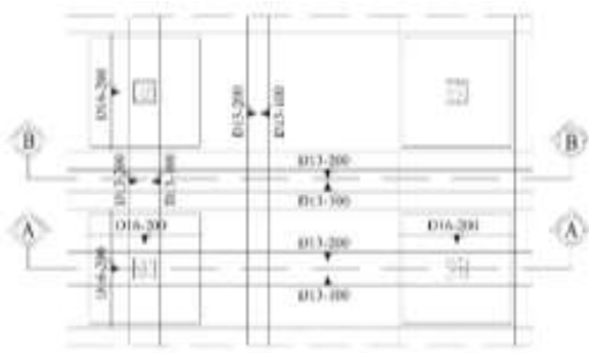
Reinforcement Plan of Flat Slab and Drop Panel on 3rd floor
